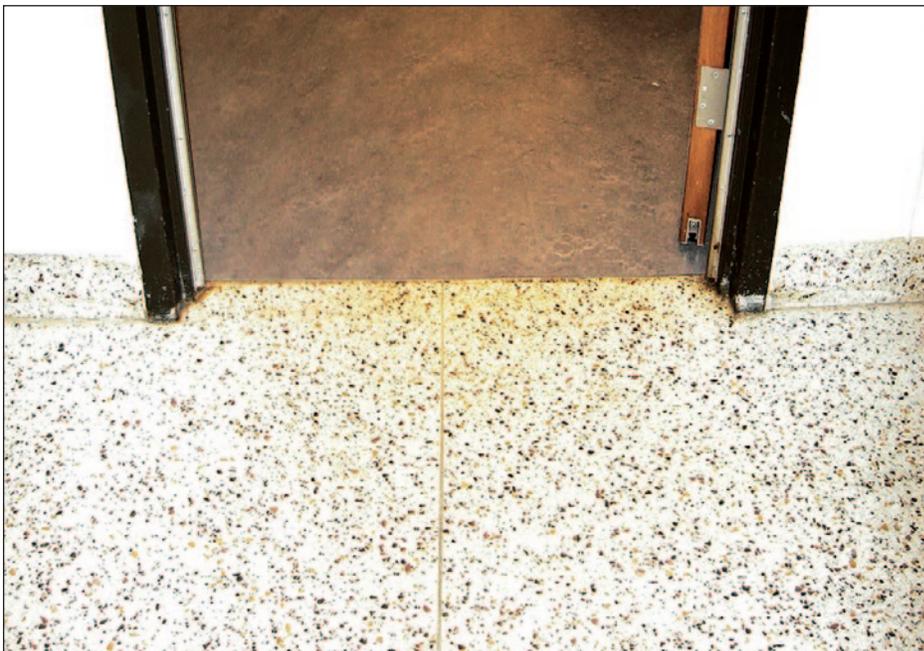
Carpeting was replaced with flood damage-resistant vinyl flooring throughout the damaged academic buildings (Oshkosh, Wisconsin).
